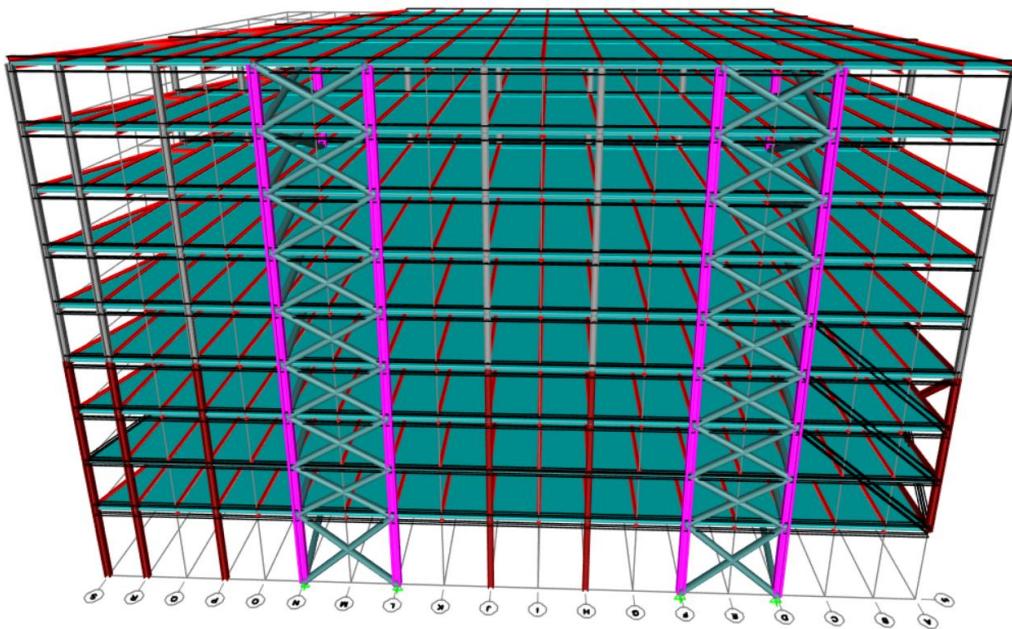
Elevation View from West to East for Proposal 1 (SAP2000)
